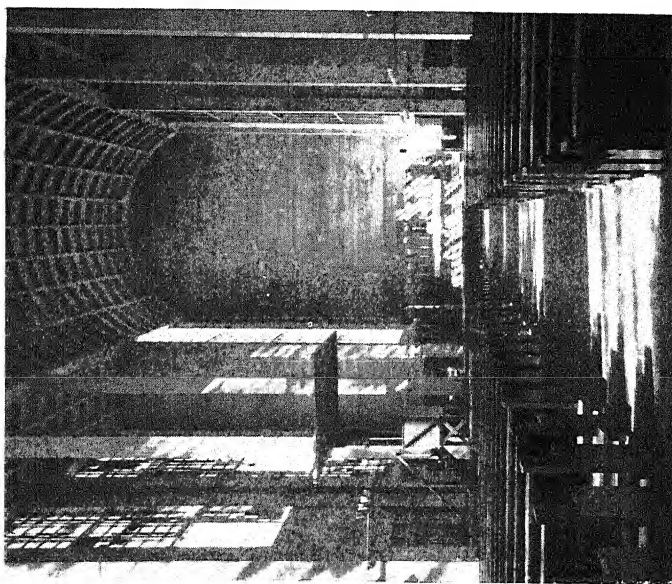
Structure and walls of the Church of St. Antoine, at Bâle, are of reinforced concrete. Karl Moser, architect.
